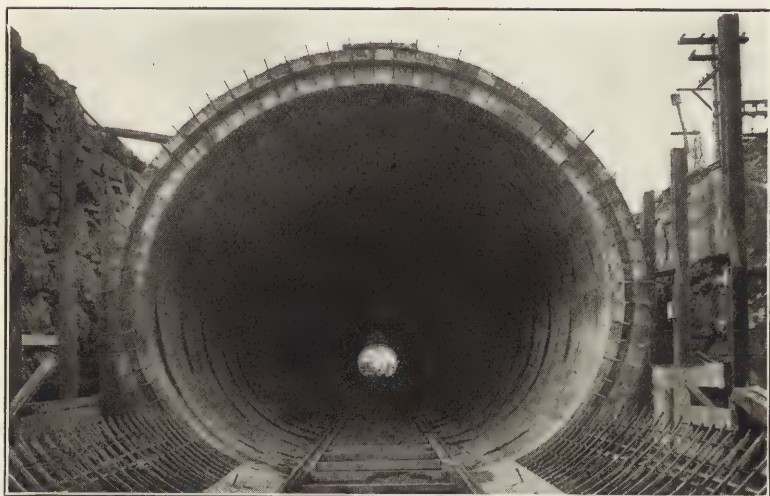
Section of 18-ft. Concrete Conduit, Ontario Power Company, Niagara.
